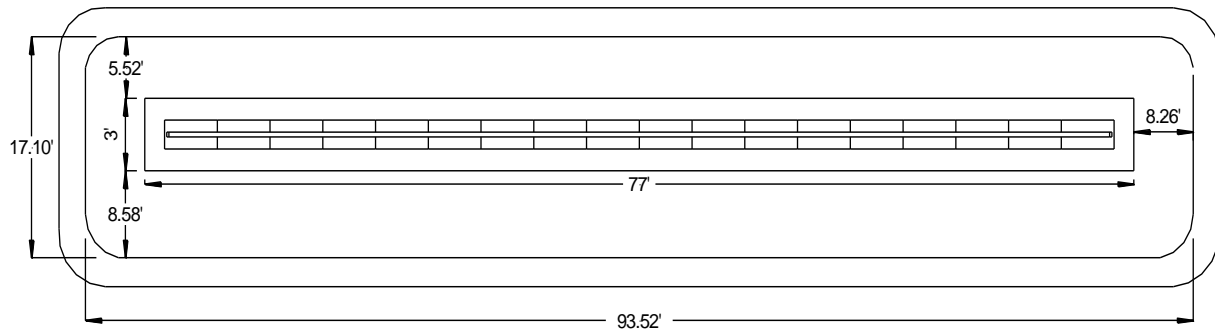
PLAN VIEW – MOUND SYSTEM
